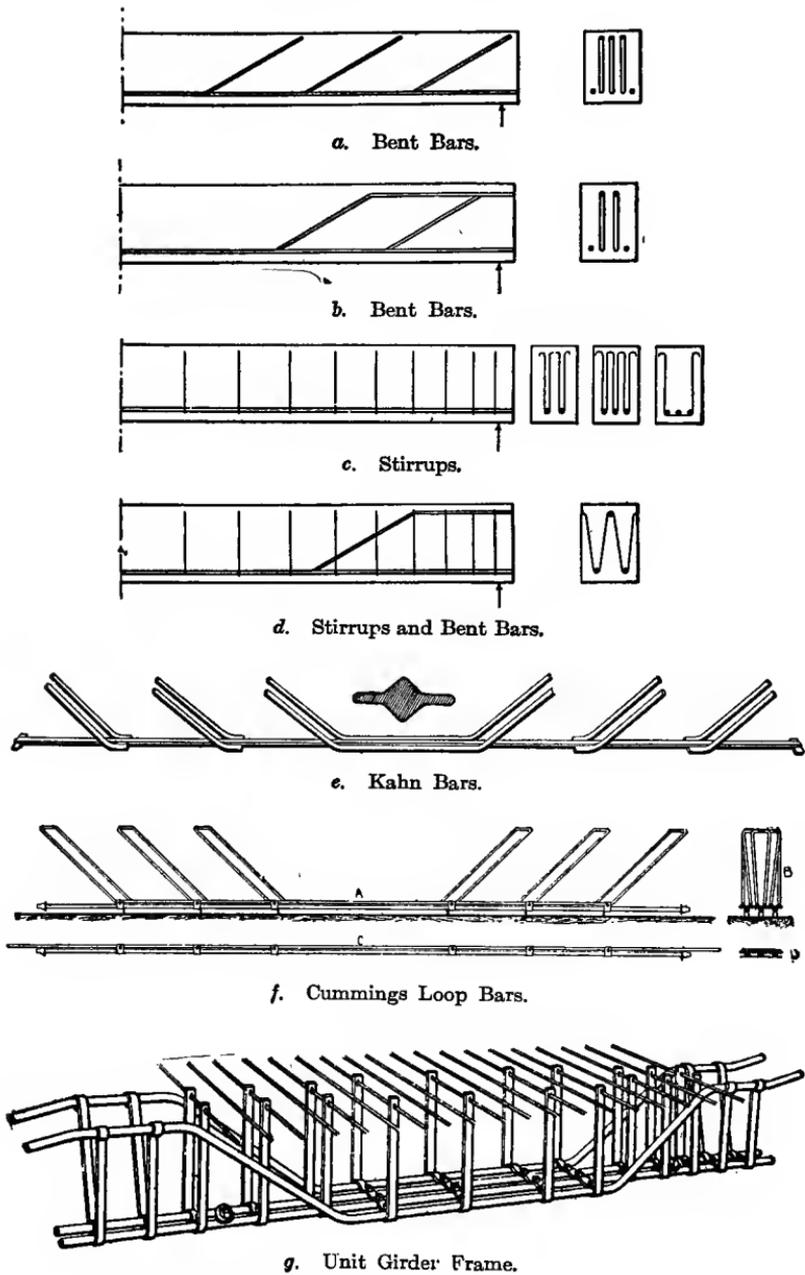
TYPICAL EXAMPLES OF WEB REINFORCEMENT.
